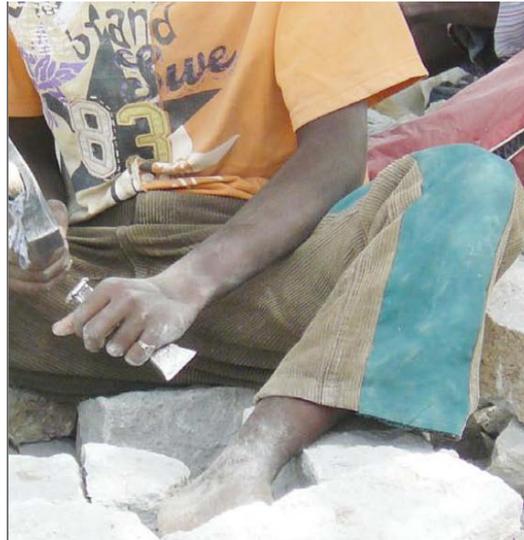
Stone shaping (Giz/Ethiopia, 2008)
